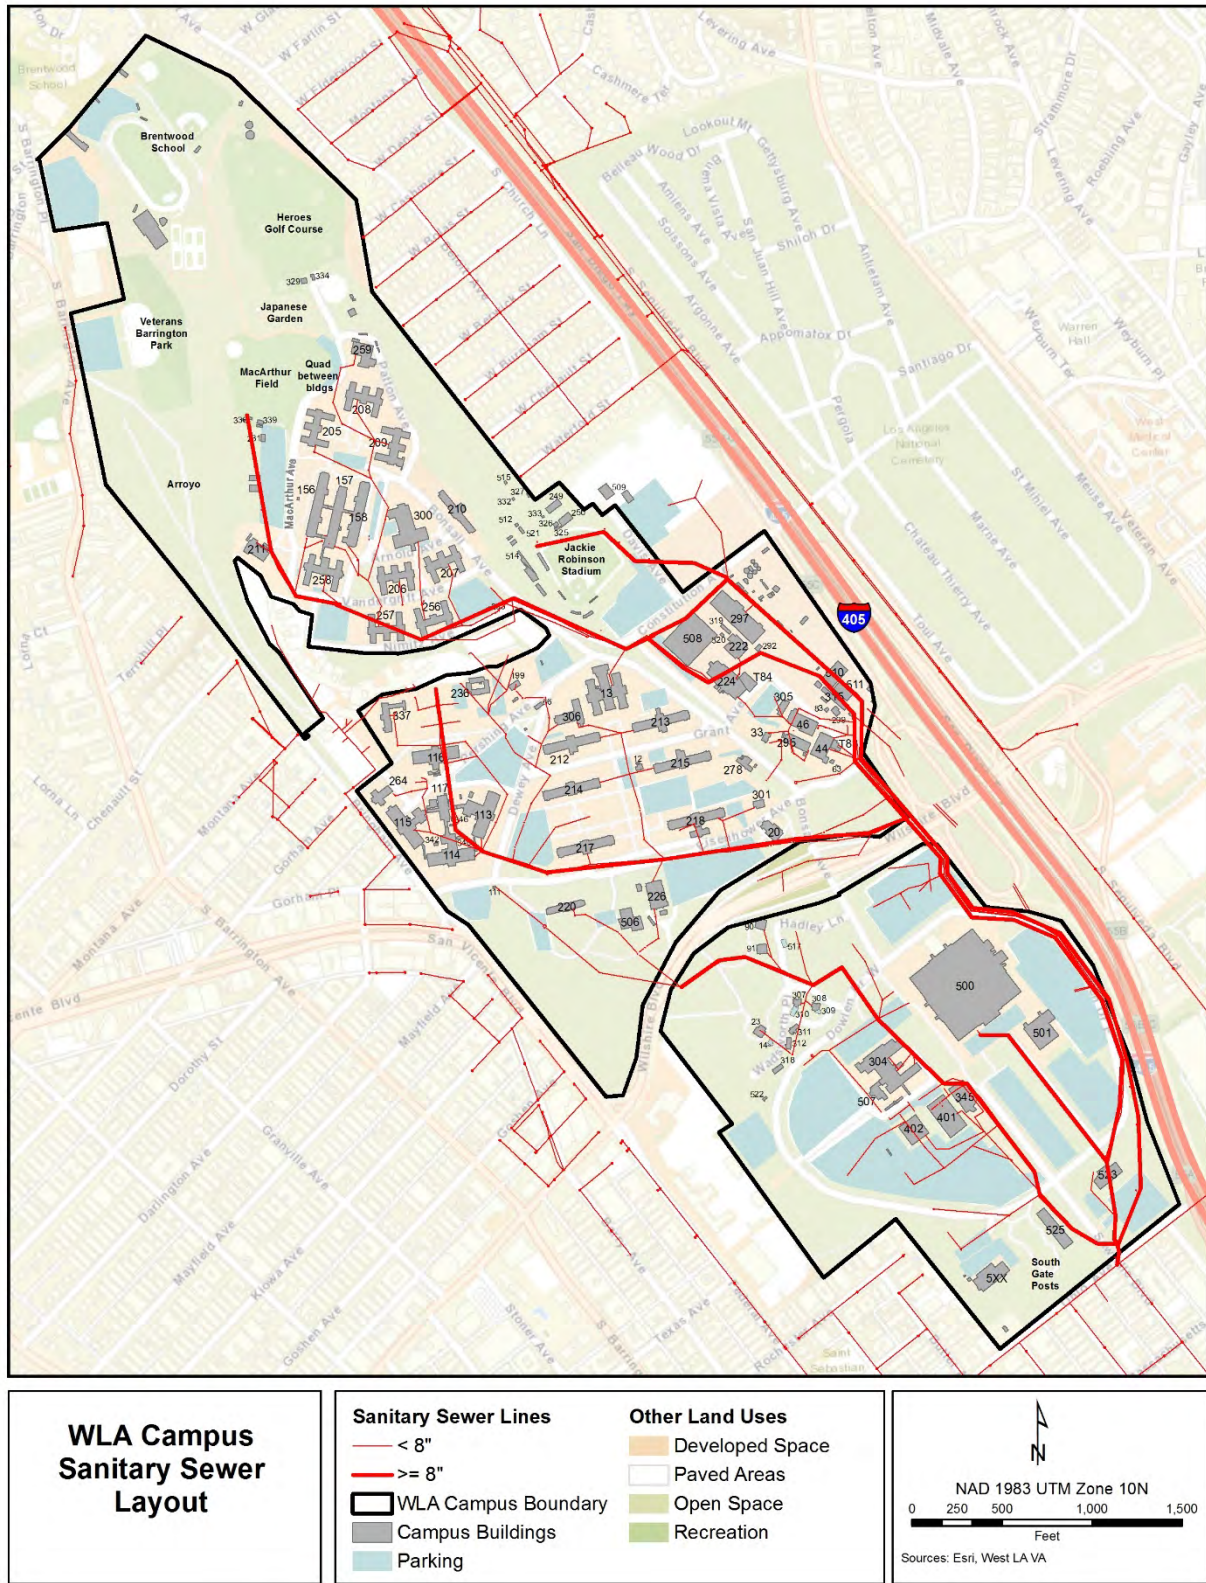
WLA Campus Sanitary Sewer Layout
